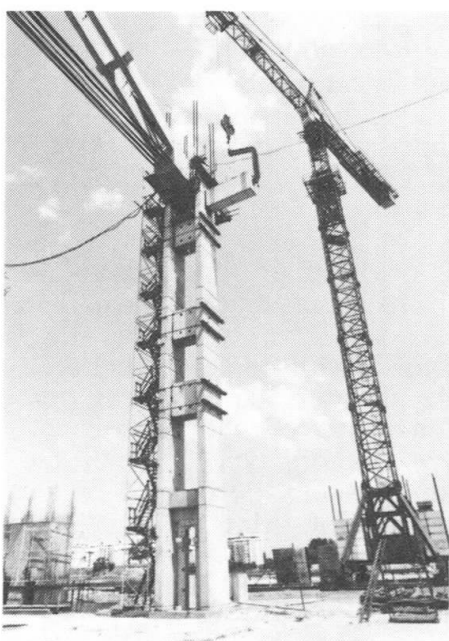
Pushing of the precast supporting beam through the openings on the top of the column
